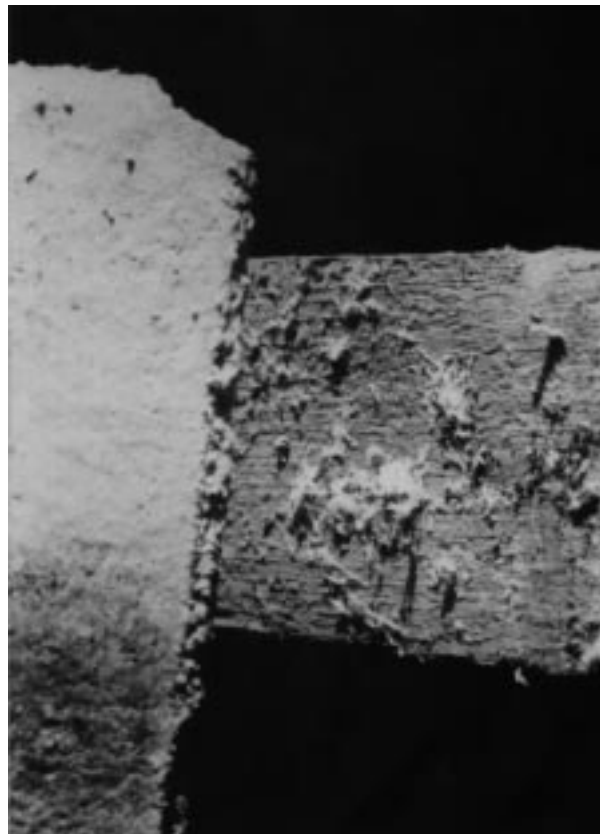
Asbestos fluff contaminating roof tile battens of ACT house
